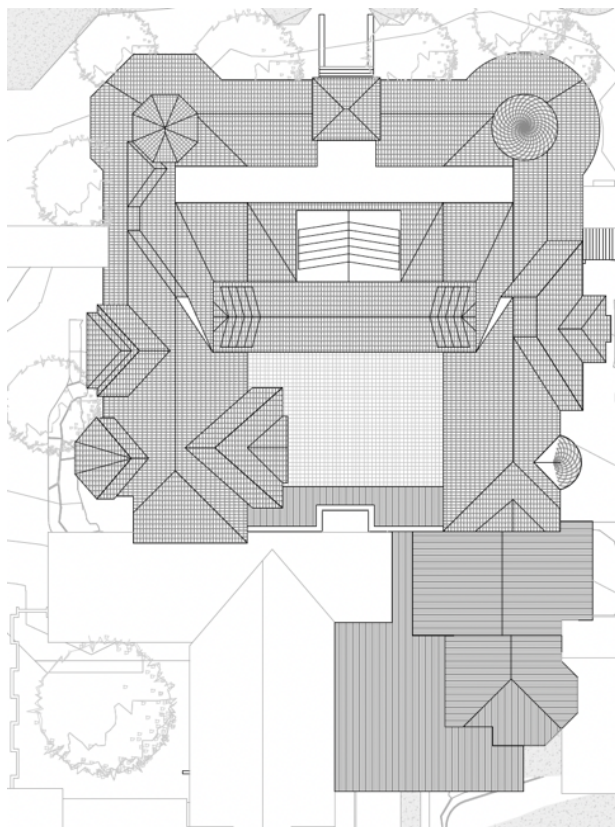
EXISTING ROOF PLAN. St John of God Richmond Hospital.
